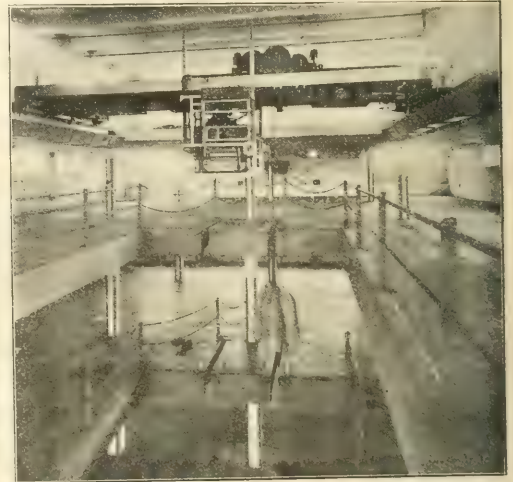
30-CWT. OVERHEAD TRAVELLING WAREHOUSE CRANE AT SOUTH LAMBETH.
